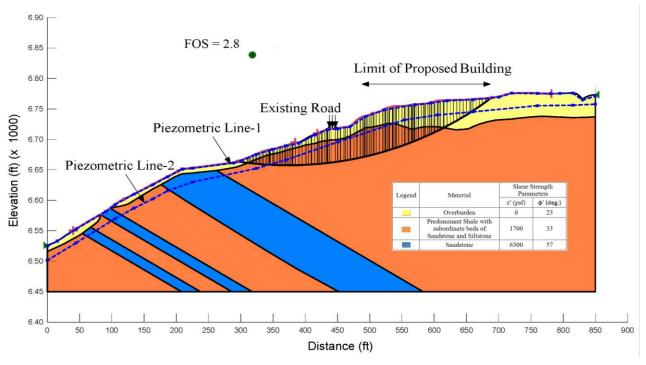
Existing Slope Section 2-2' - Critical Failure Surface through Rock Mass
